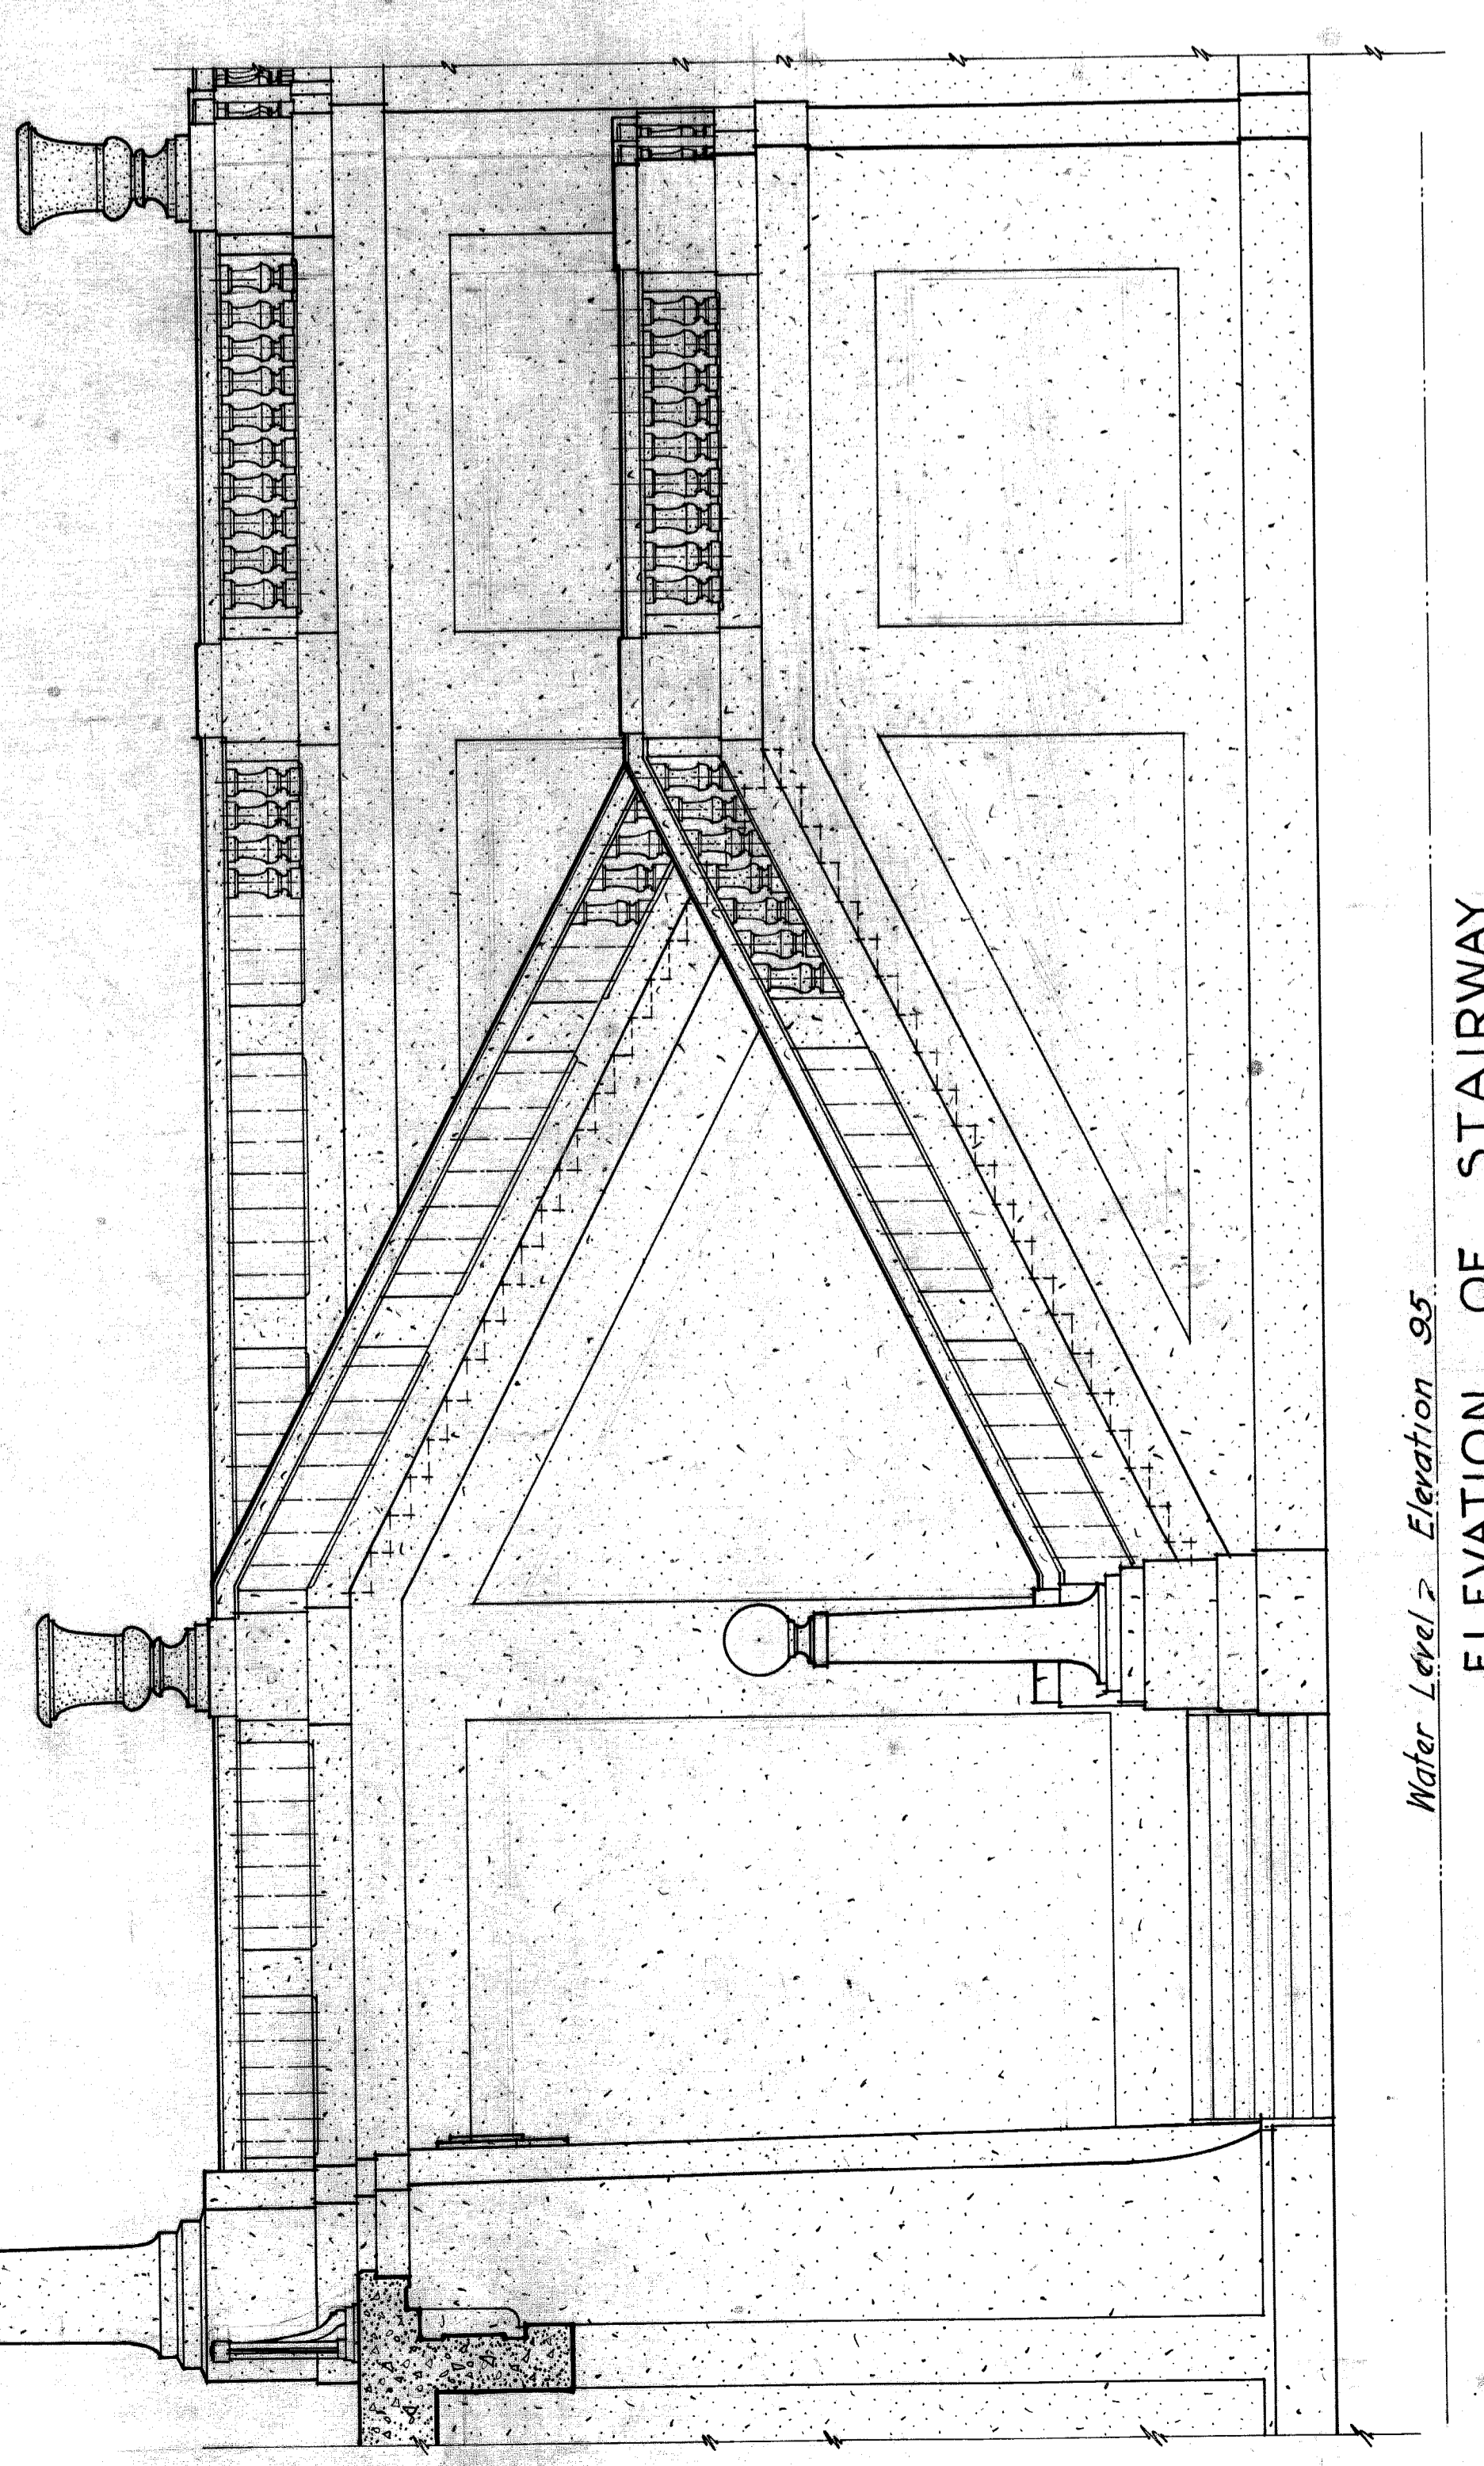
DETAILS OF BALUSTRADES AND POSTS AT STAIRWAYS
